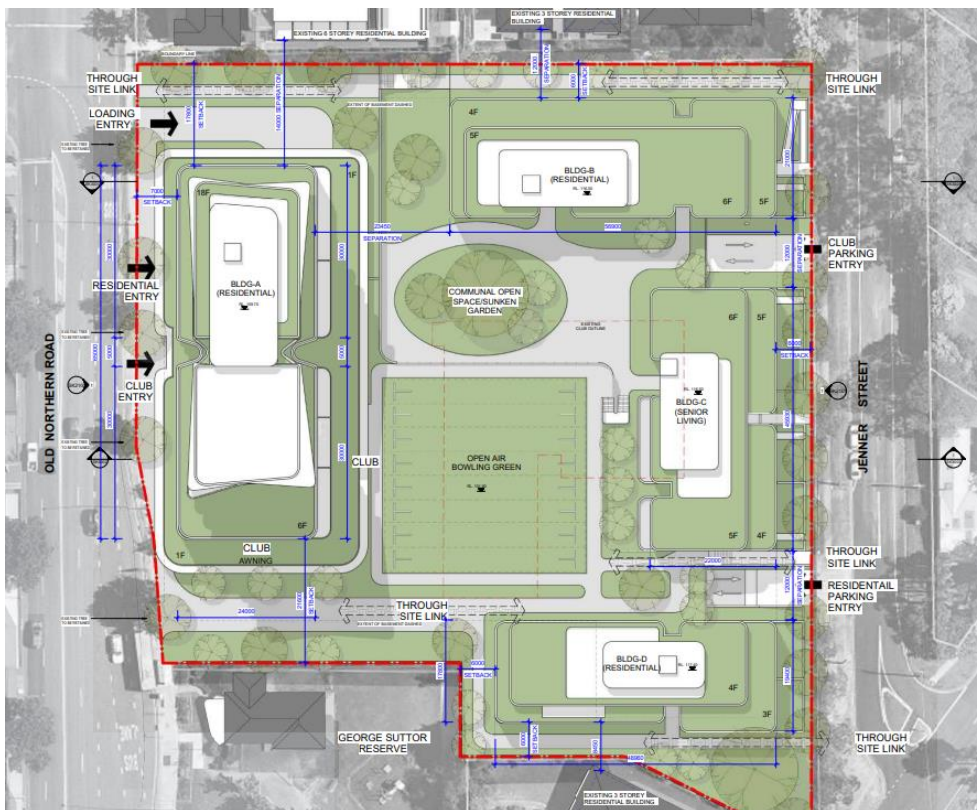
Site Plan showing building setbacks compliant with the controls prescribed above (Source: Altis)
